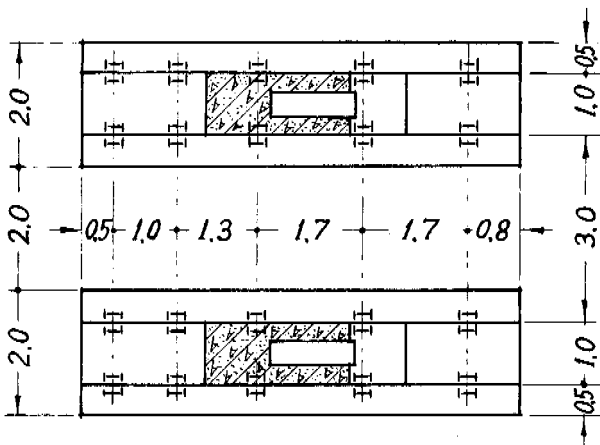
Anchor foundations of a suspension bridge across the Irelyakh River.
